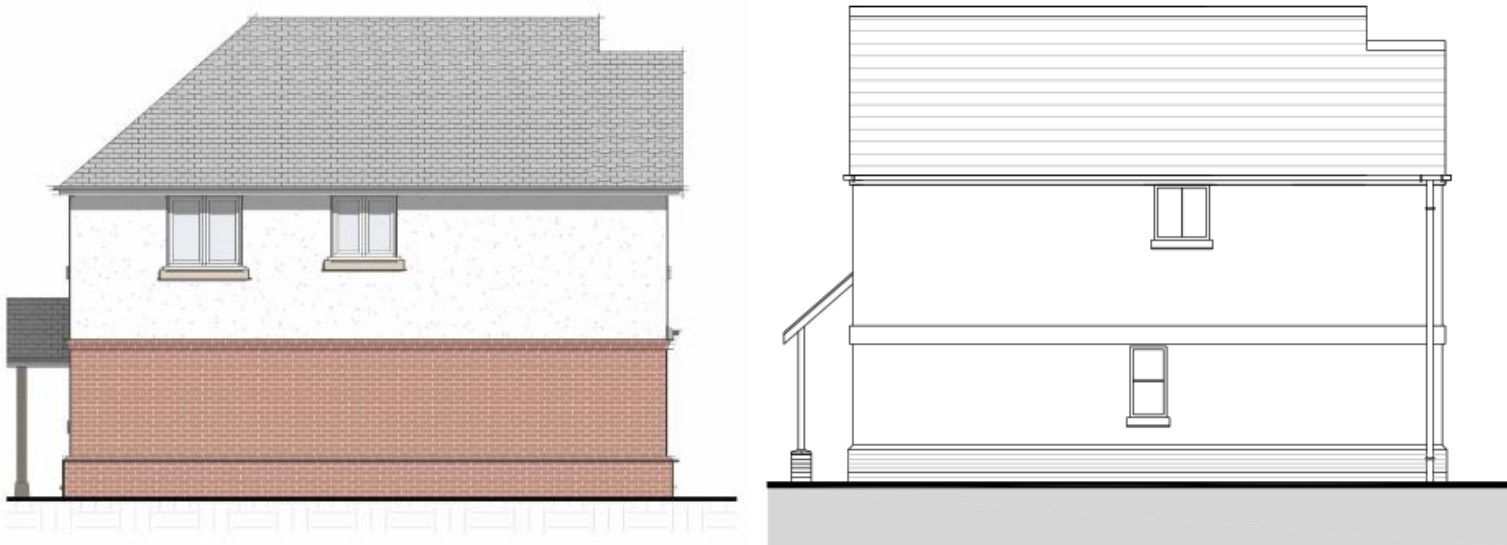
Revised Side Elevation (Left) Original Side Elevation (Right)
